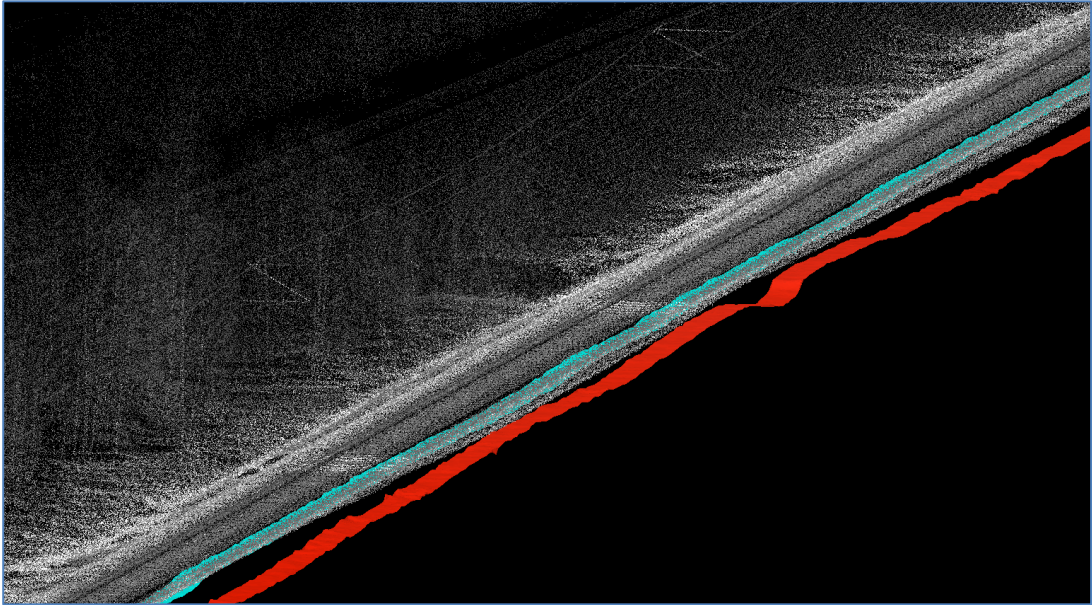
Illustration of railway construction with ballast- and subgrade thickness, in 3D.
